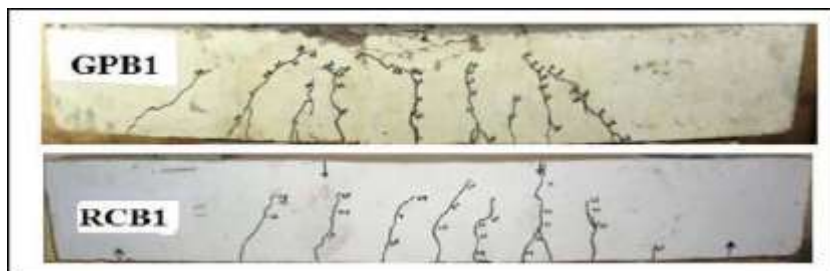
Crack patterns of geopolymer and conventional reinforced concrete (Abraham et. al. 2013)
